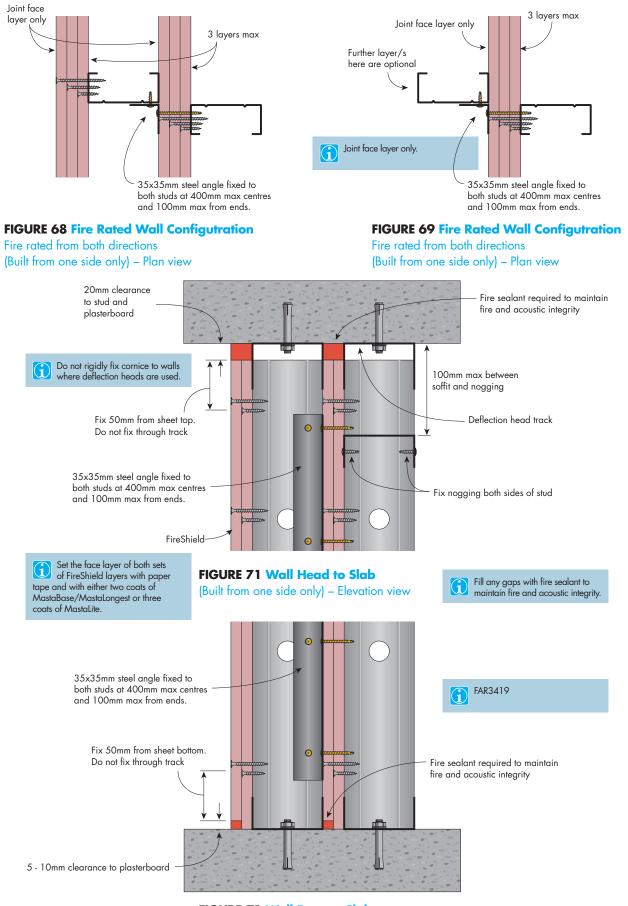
Wall Base to Slab (Built from one side only) – Elevation view
